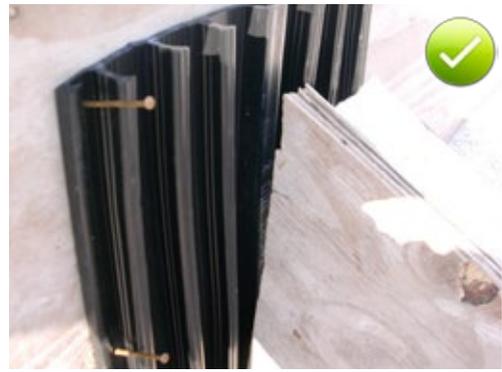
Fixing an external expansion joint waterbar to the nail strap with nails after the first half has been concreted in
